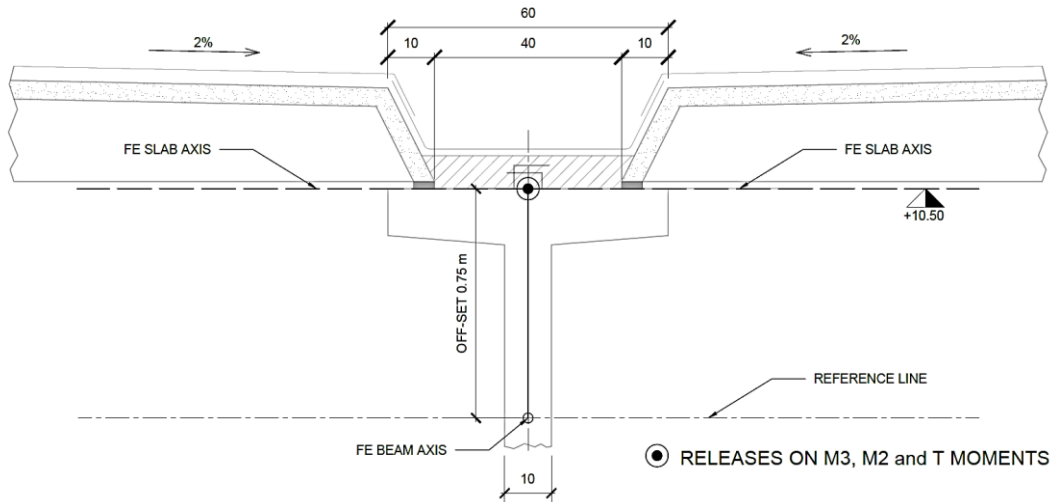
Beam to slab connection modeling scheme (units in cm).
